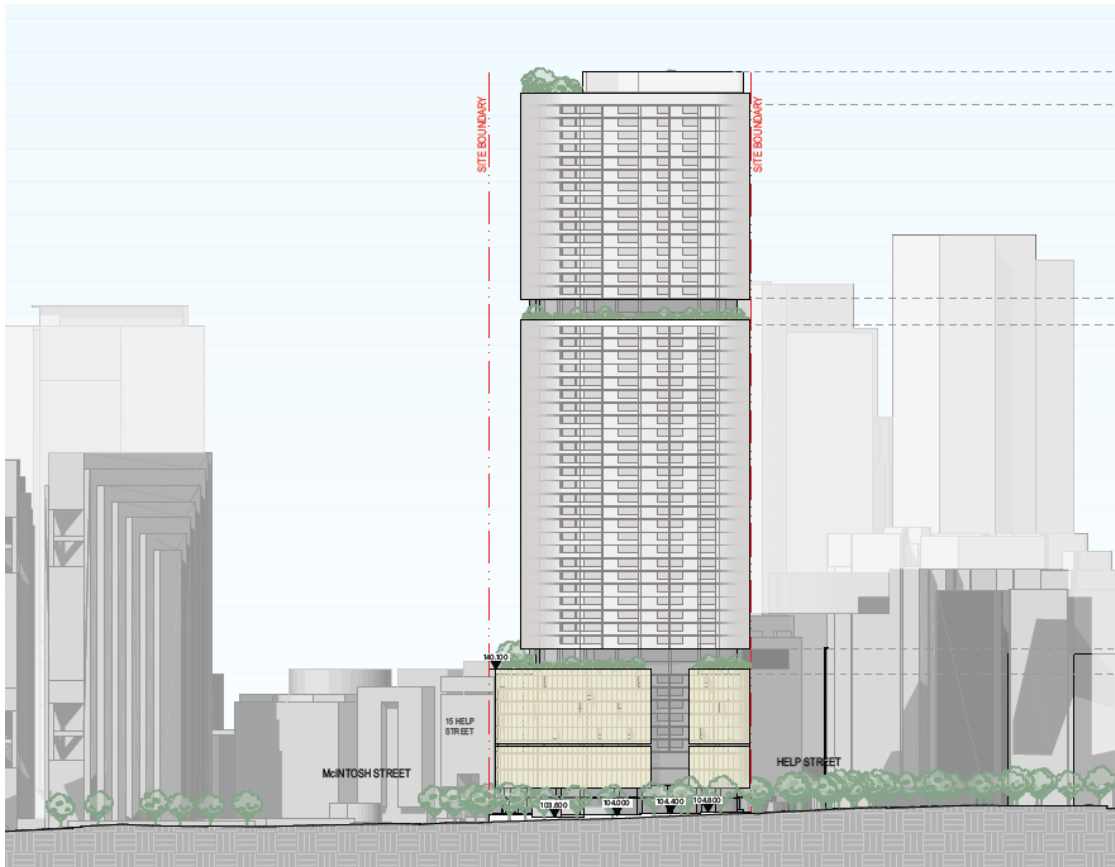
Extract of proposed plans showing the Pacific Highway Elevations
